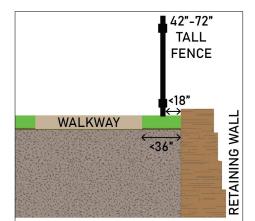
A-2-E-1: Requirement for fence when retaining wall is adjacent to walkway.
